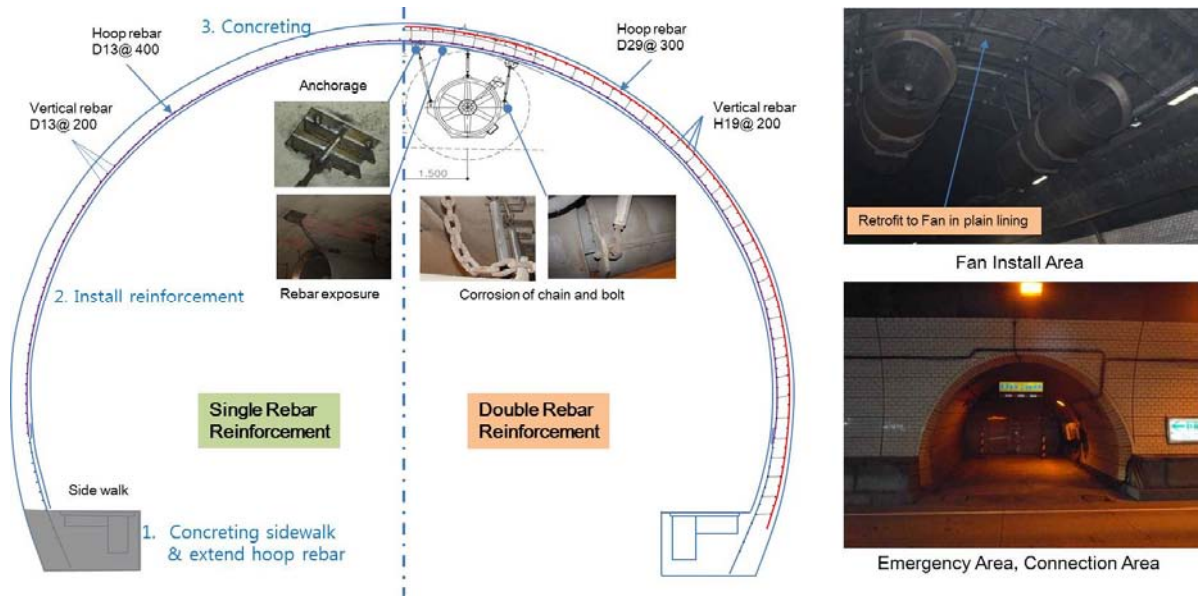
Typical installment of reinforced lining in NATM tunnel (road tunnel)
